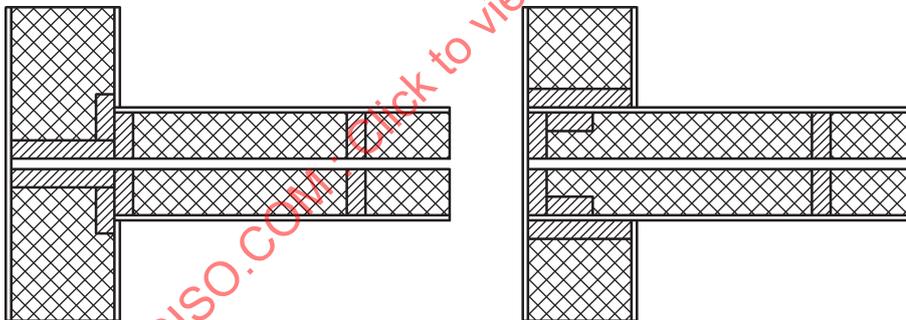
Examples of T-junction between a façade and a double frame separating wall
